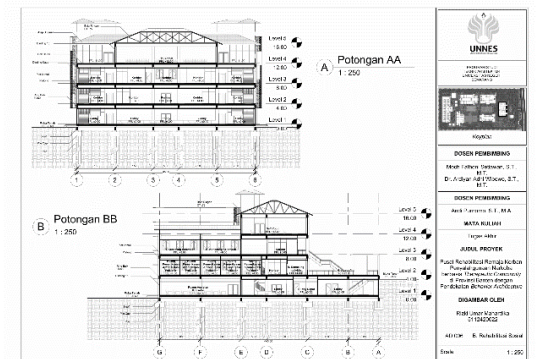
Social Rehabilitation Building Section A-A and Section B-B
